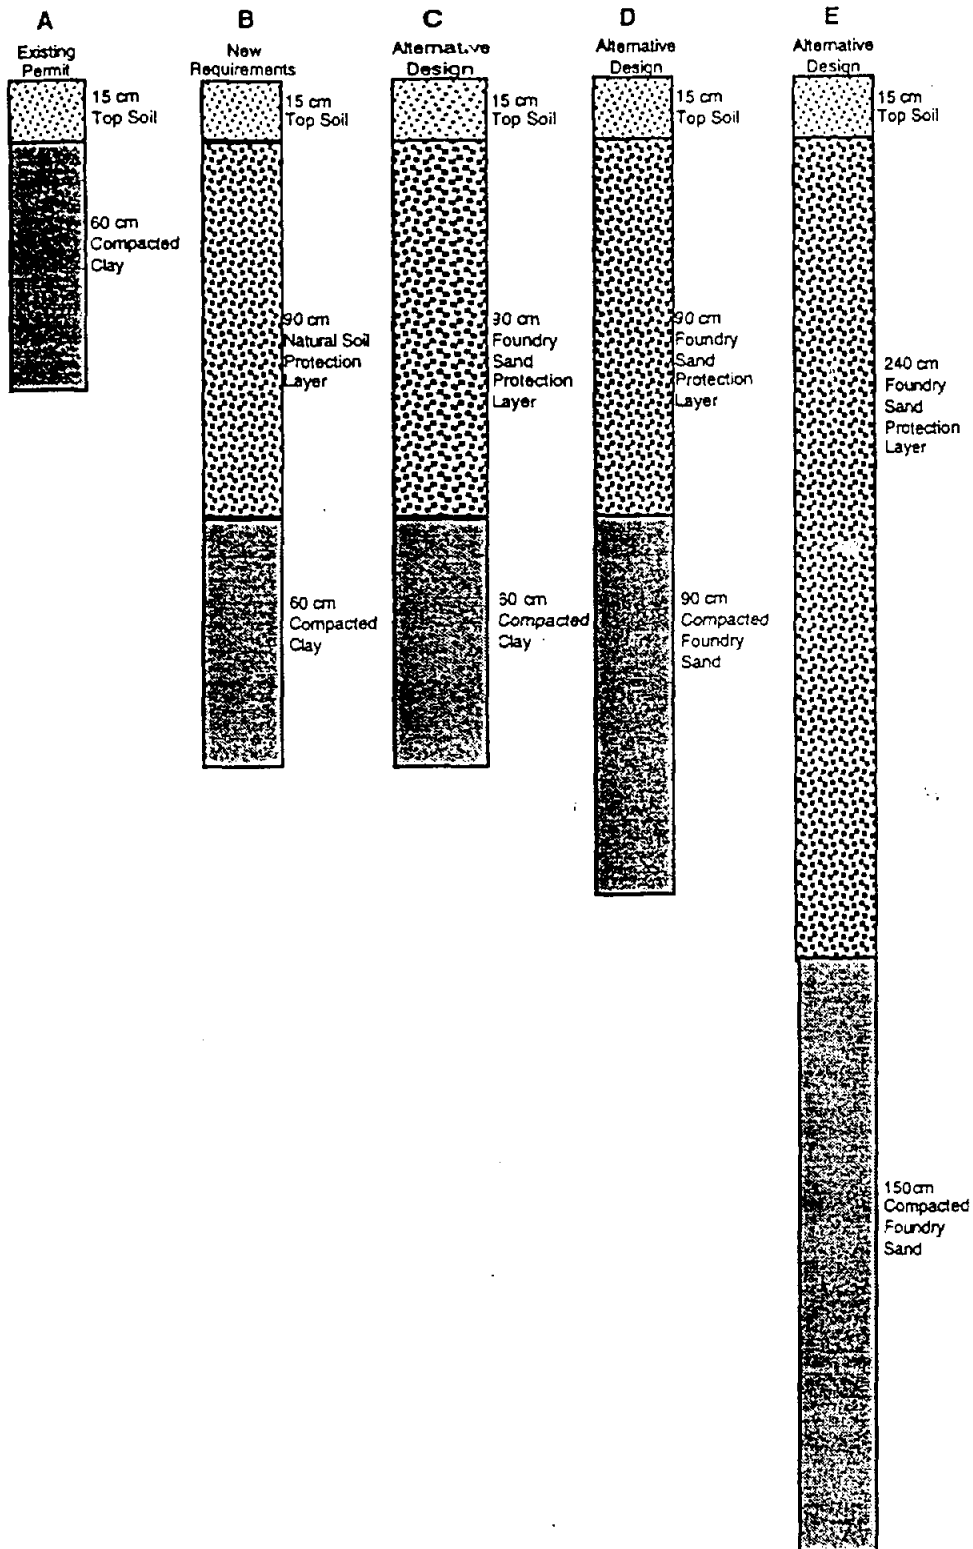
Layering Used in Alternative Cover Test Sections - Grede Foundries, Reedsburg, Wisconsin.
